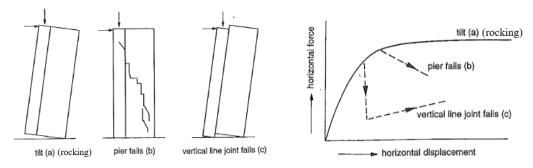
Possible failure mechanisms of a U-Shaped wall [1]
